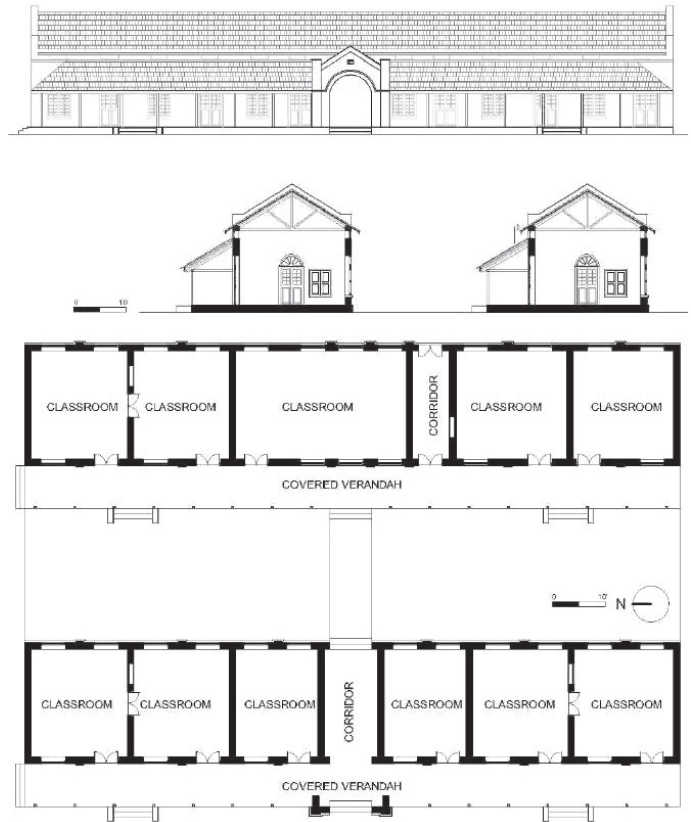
Municipal Boys Higher Primary School, 1922 West Front Elevation, Transverse Section and Ground Floor Plan.
